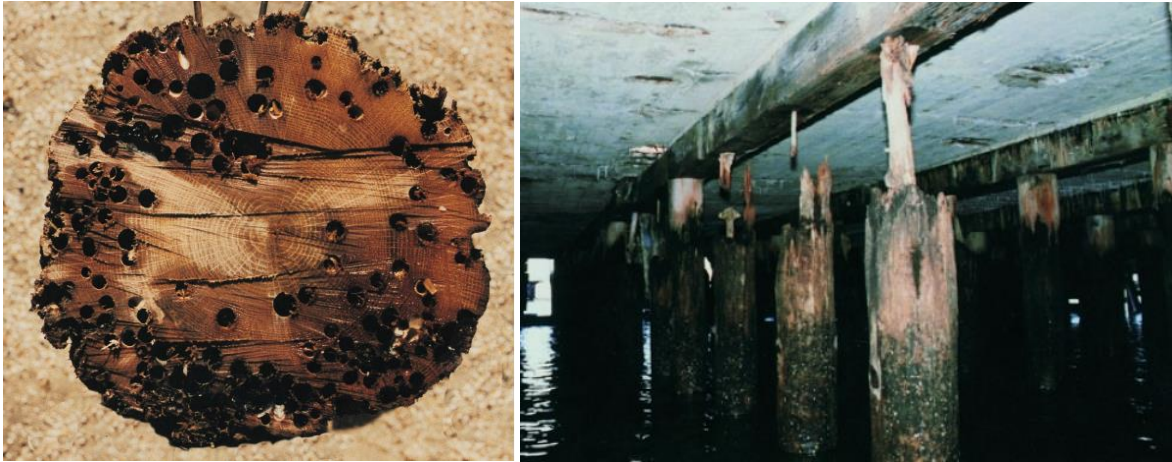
Tunneling in a timber pile caused by Teredo and Bankia (Left), untreated timber piles attacked by Limnoria (Right) (Iskander 2002)
